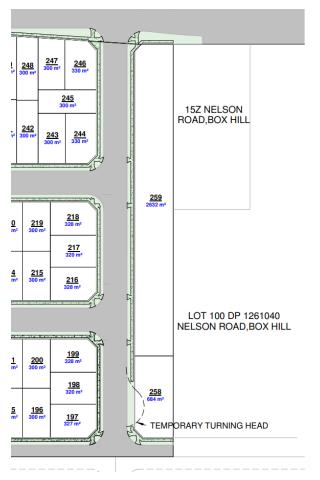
Extract of Proposed Subdivision Plan for DA 653/2023/ZA
